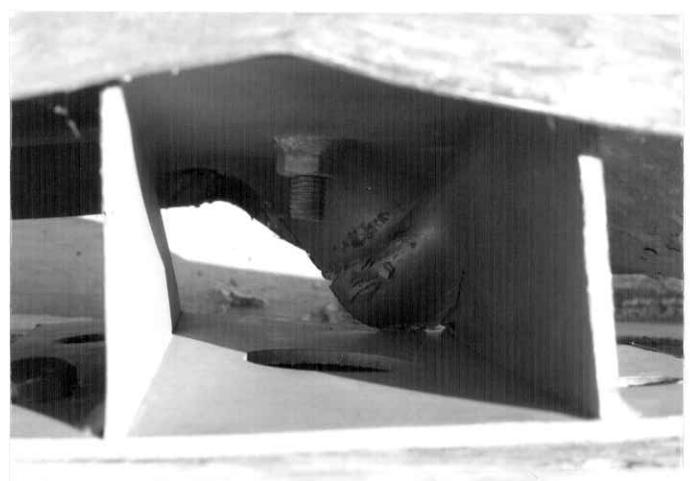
Arizona guardrail transition to concrete barrier after test 7155-9.
